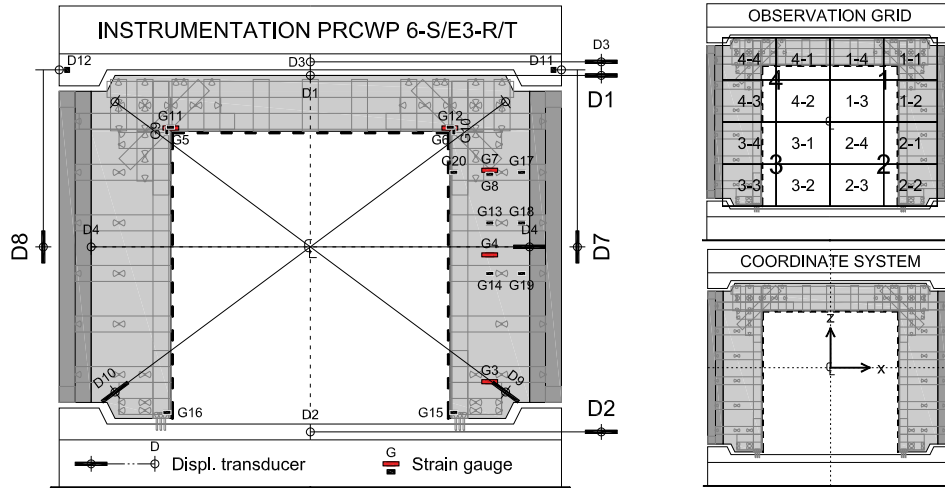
Instrumentation layout of specimen PRCWP 6-S/E3-R/T
